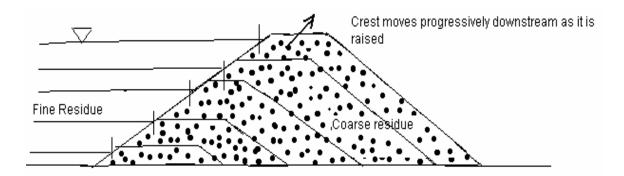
Downstream tailings dam construction (Klohn, 1980 and Blight, 1996).
